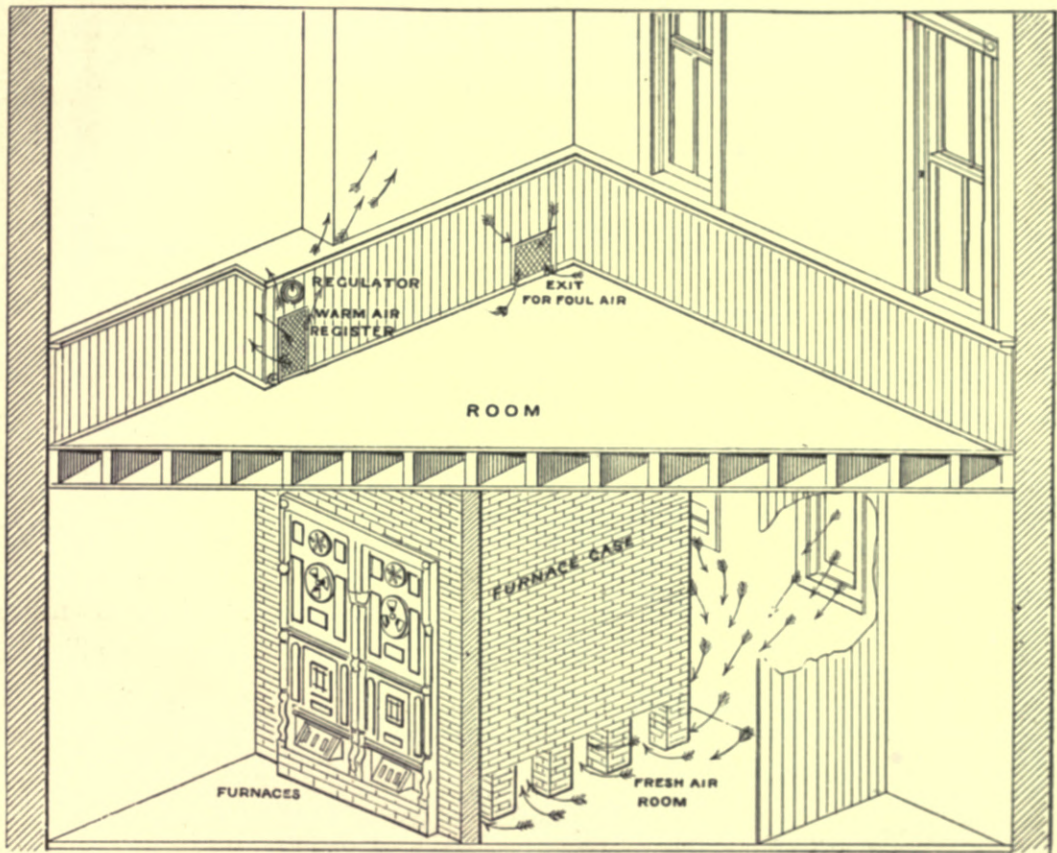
View of "Smead" Furnace set in Brickwork.
